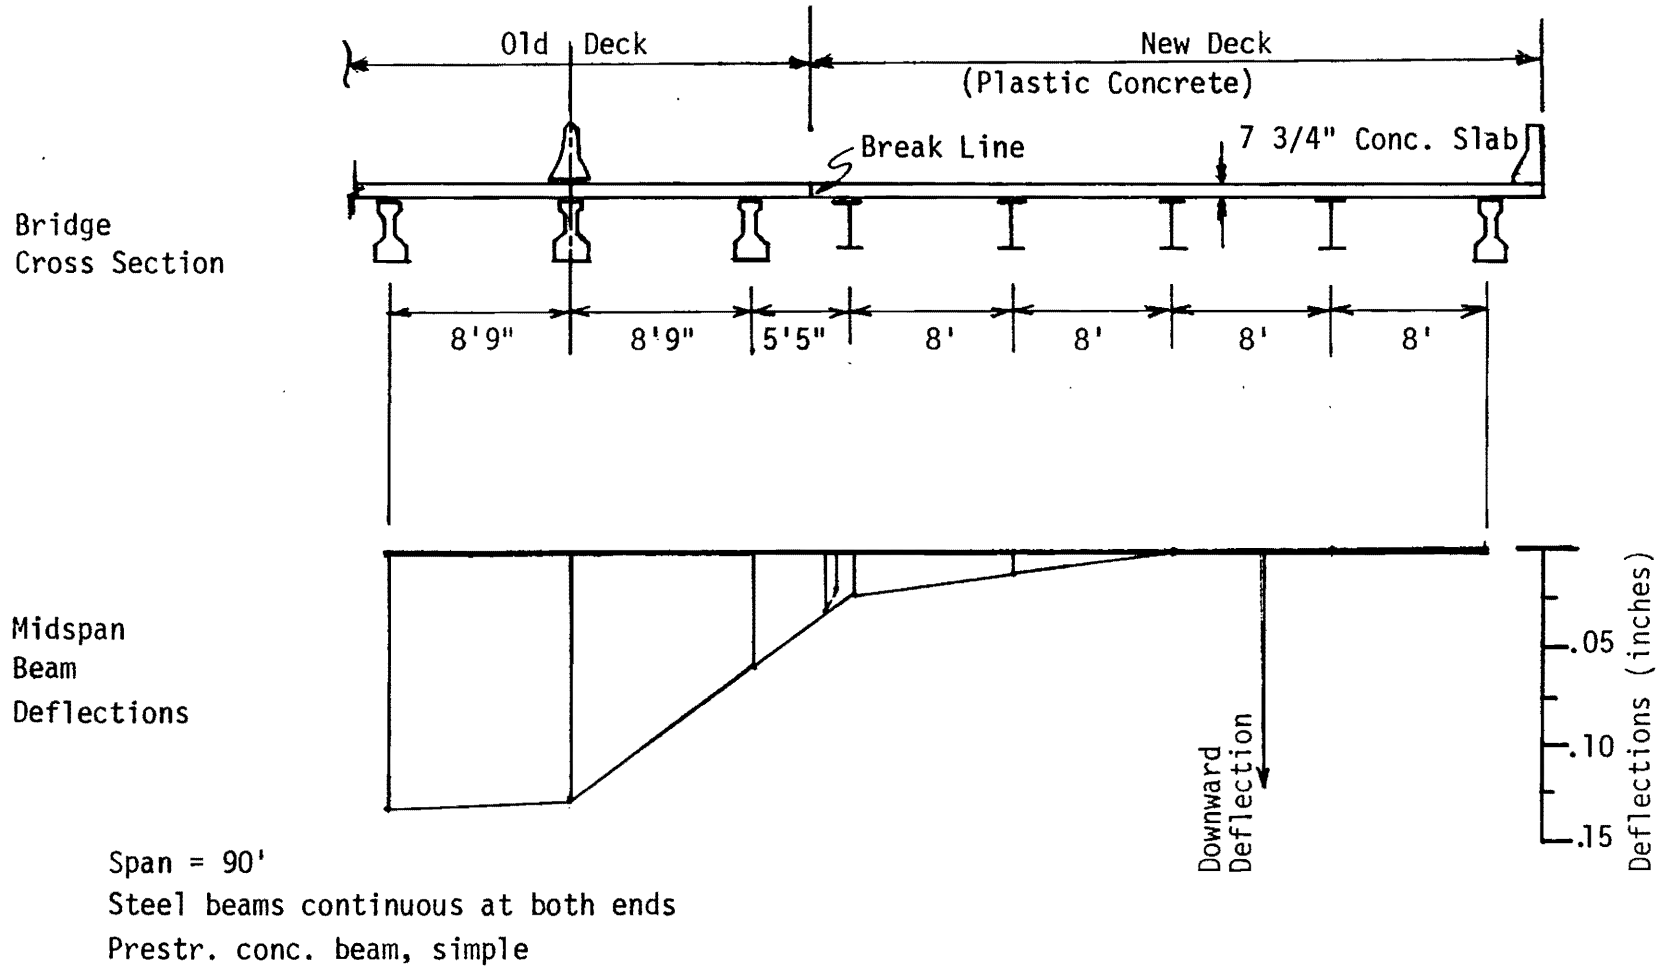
b. US 75 & White Rock Creek, Dallas, Northbound (90' Span),
